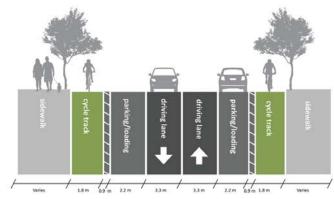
Danforth Avenue Complete Streets Pilot Design Cross Section (without curbside natios)
